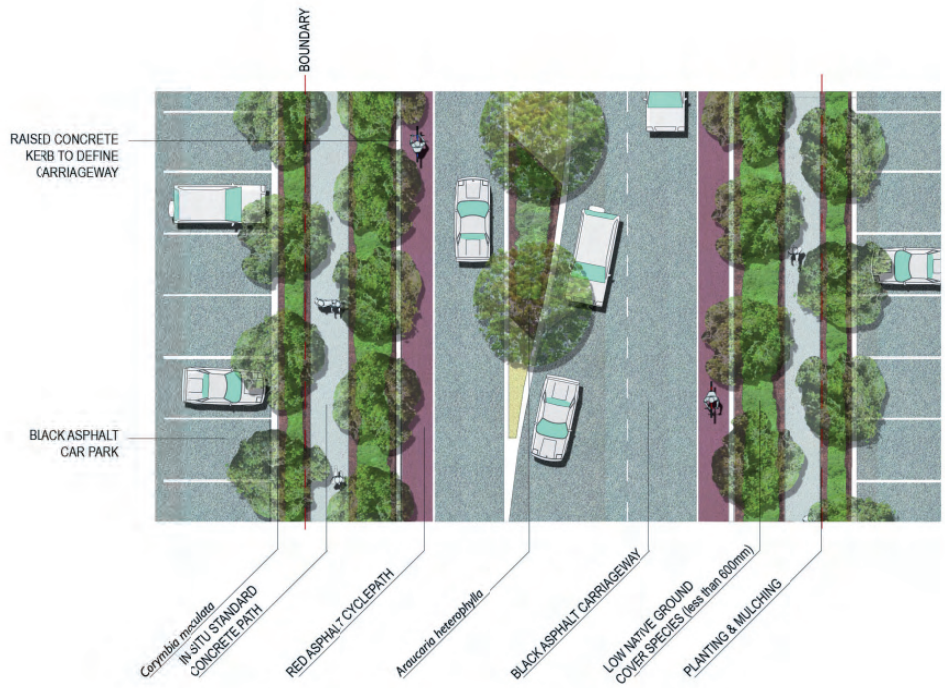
Butler Boulevard Cross Section between Marmion Avenue & Camborne Parkway (Precinct C)
